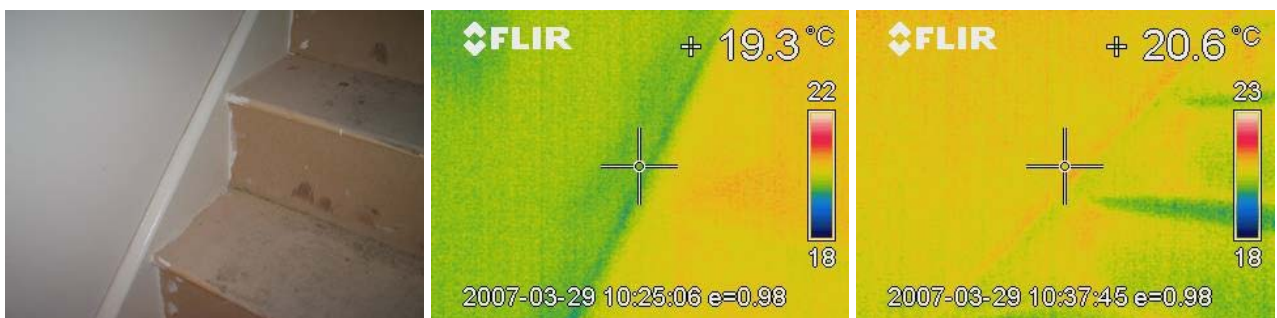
Air movement through shrinkage cracks on the lower and upper sets of stairs, with cooler air emerging at the lower staircase and warmer air at the upper staircase.
